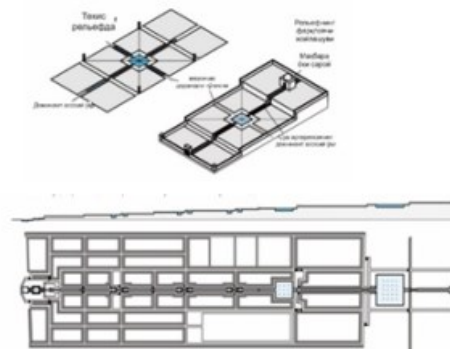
"Chor-bog" traditional water structures. Irrigation of "garden": a) horizontal surface in the plain; b) perimeter construction; c) relief plane, at a slope of 2-10%.
